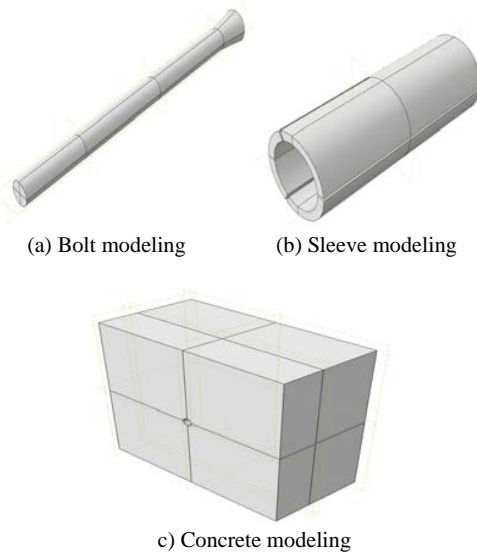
3D Finite Element Model of Structural System and Anchor System
